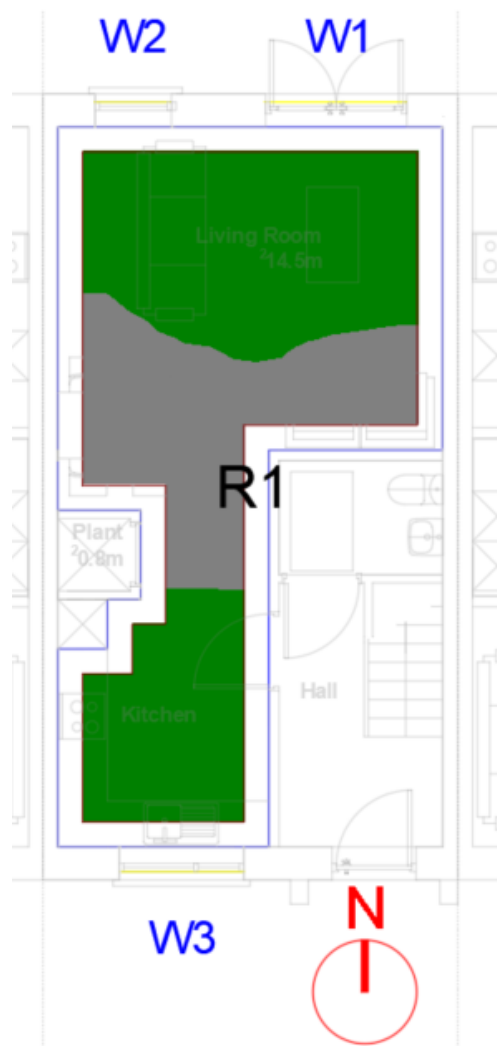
Proposed Ground Floor sDA Contours of House G-02 2-073
